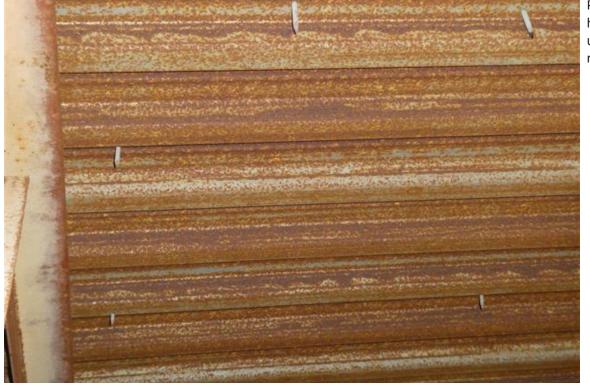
Corrosion has formed on the underside of the metal roof deck.
